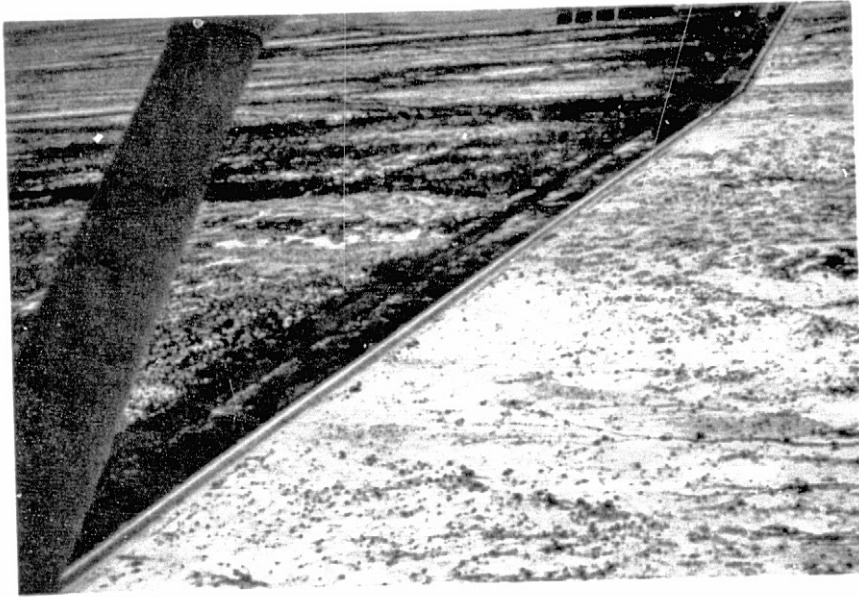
Infrared aerial photo of the structure and upslope-downslope vegetation (Structure #15).
